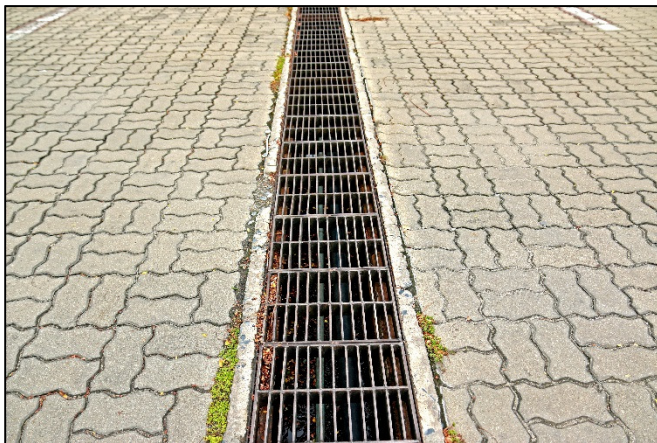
Trench Drain. A trench drain can be used to convey runoff to GI facilities.
